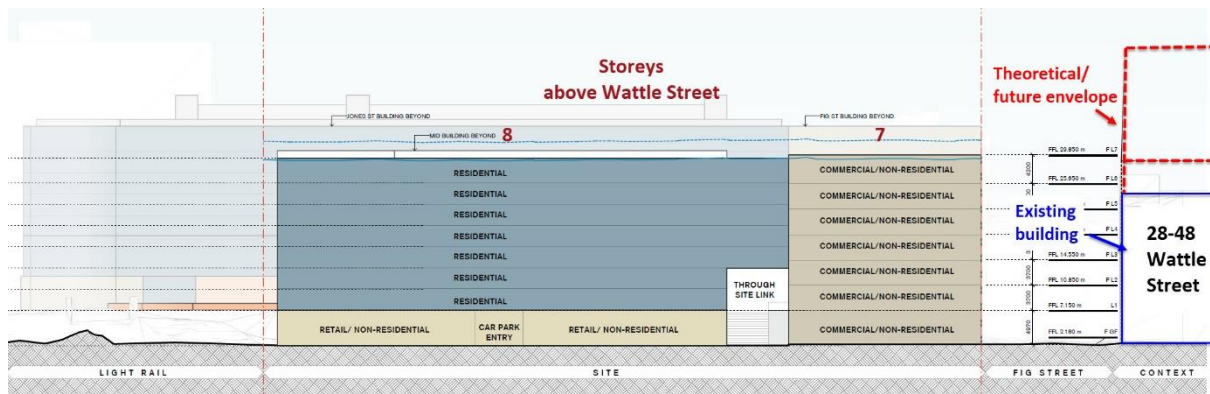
Proposed Storeys: Indicative Reference Scheme - Wattle Street Elevation
